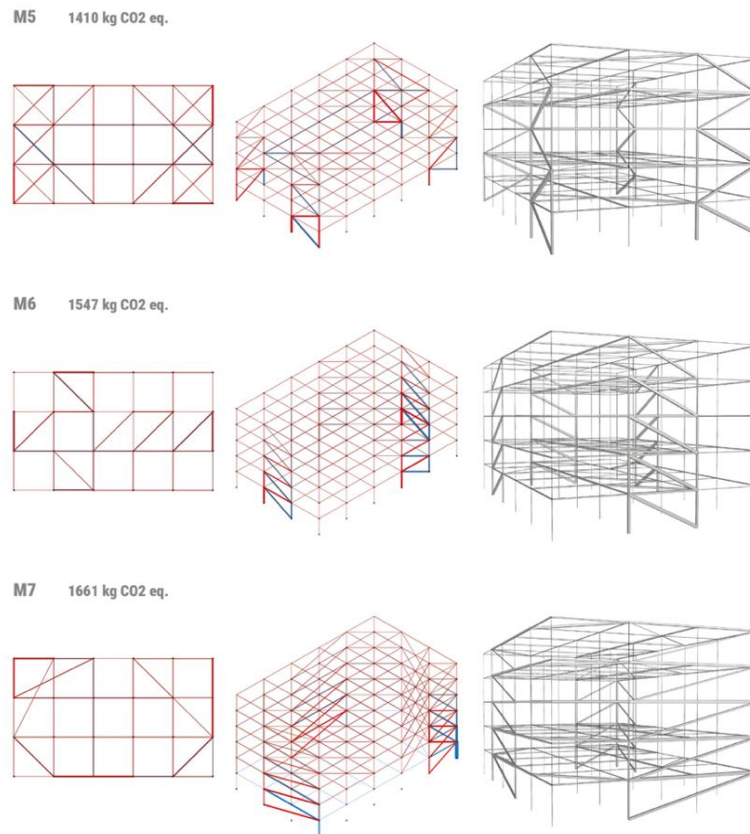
Plan, isometric and two-point perspective views of the bracing models M5 (continuous façade), M6 (sequential façade) and M7 (sequential facade doubled)
